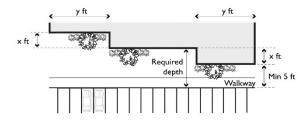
A.2.A: FOUNDATION BASE EXTERIOR WALL WITHOUT A PUBLIC ENTRANCE
